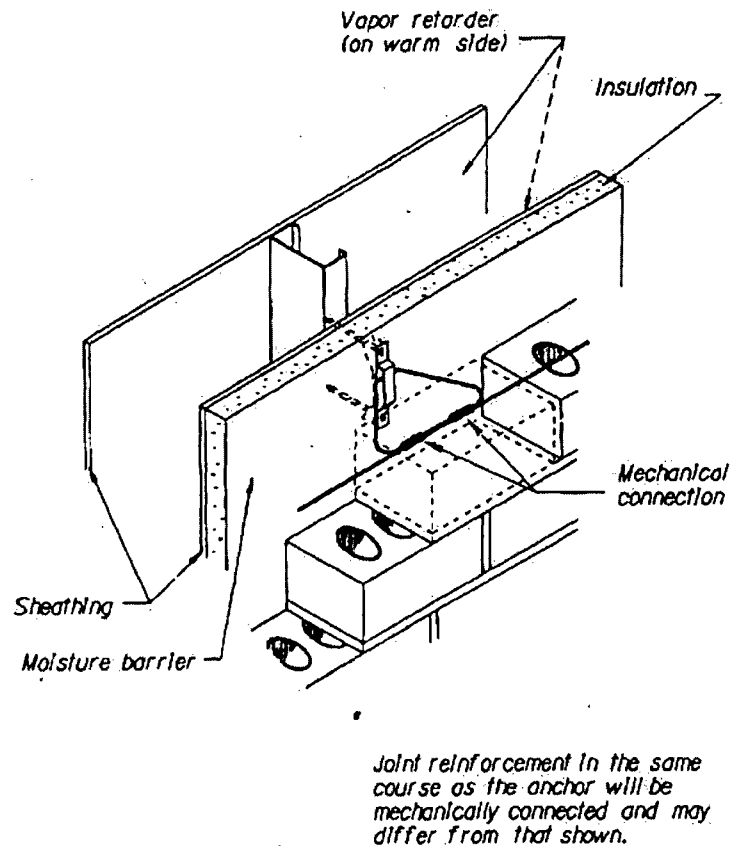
Masonry Veneer wall system, with attached horizontal wire joint reinforcement. (From Ref. 32)
